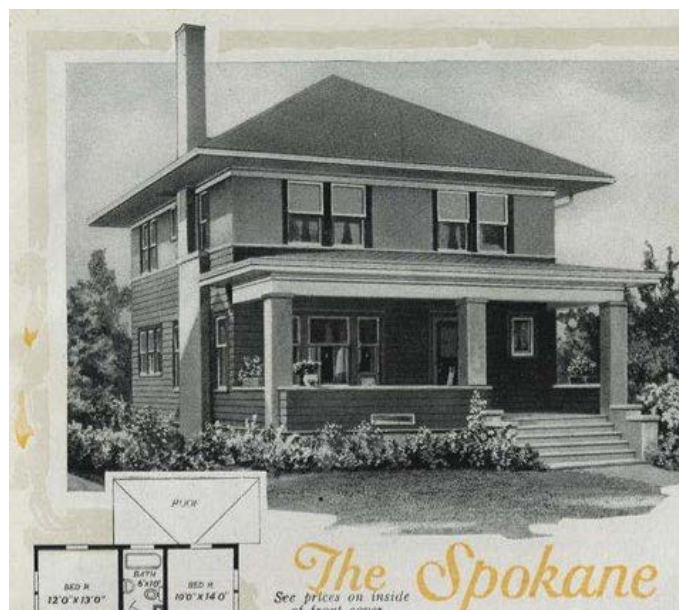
1920 Ad for Stock Plan of 'The Spokane'
